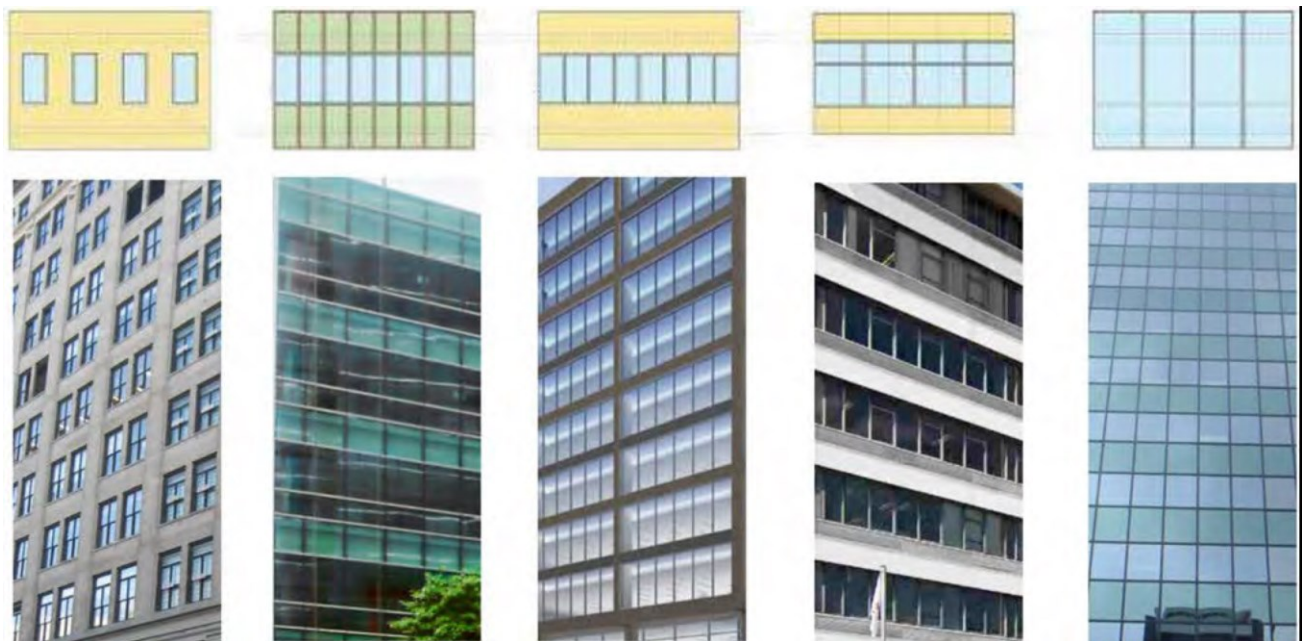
Punched holes facade, fully glazed facade, horizontal windows, recessed windows and curtain wall facade
